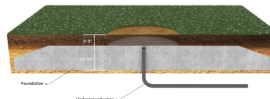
The below-ground infrastructure for a wind turbine includes the foundation and underground wires. Repowering can reuse 2-3 foot cables and 400-600 ft long. Decommissioning requires 10-15 foot removal of foundation piles and 10-15 foot removal of tower. The amount of topsoil used for backfilling a site will depend on local soil and geographic location.
